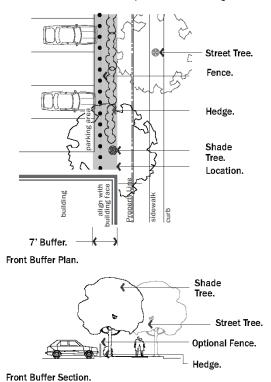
C (1). Frontage Buffer Plan and Section.
